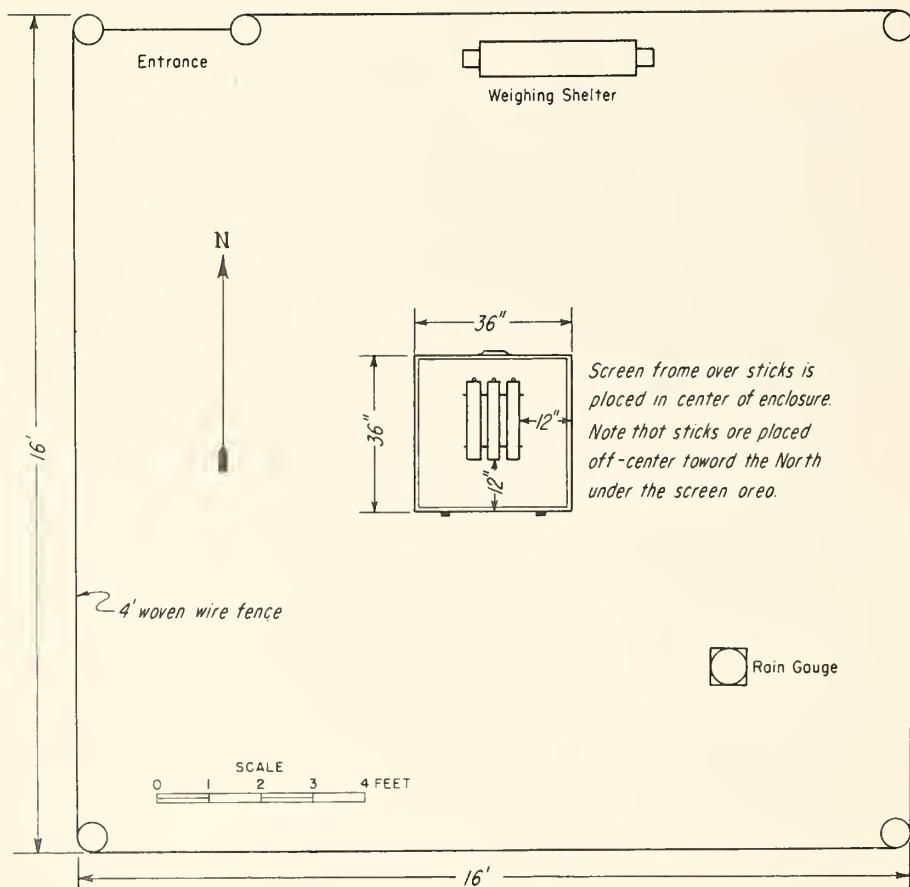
Ground plan for open fire danger station. Install anemometer on north side of weighing shelter, outside the fenced area.
